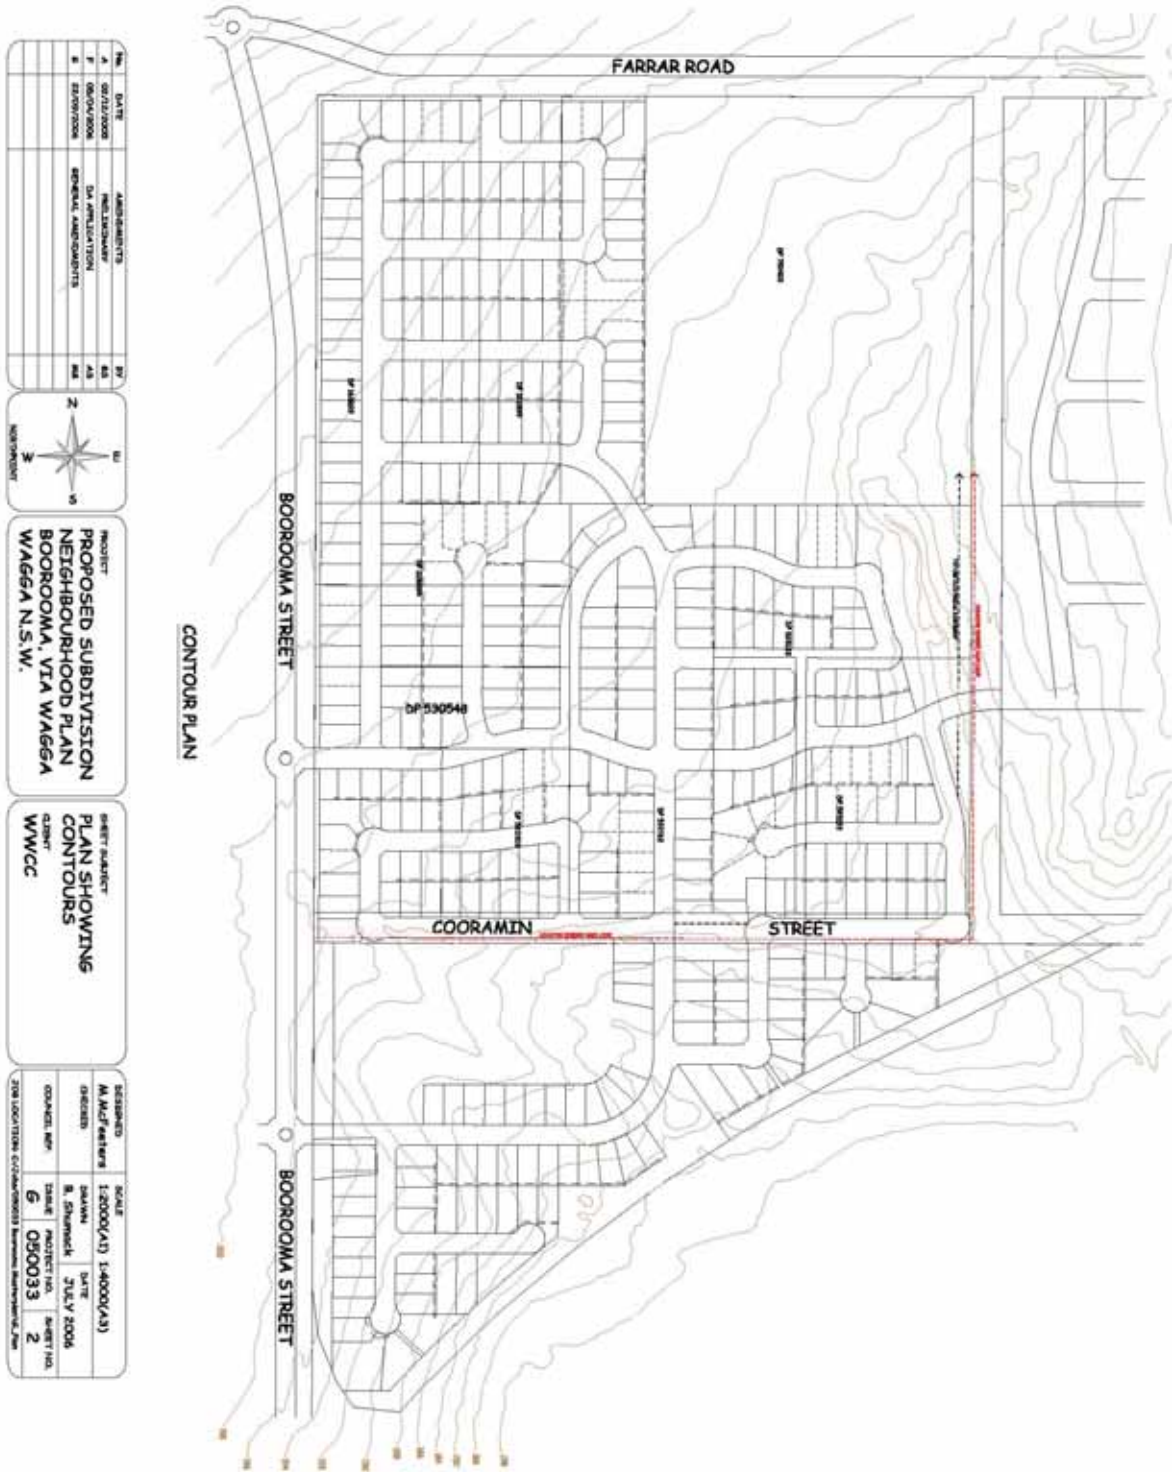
Boorooma Subdivision Neighbourhood Plan
